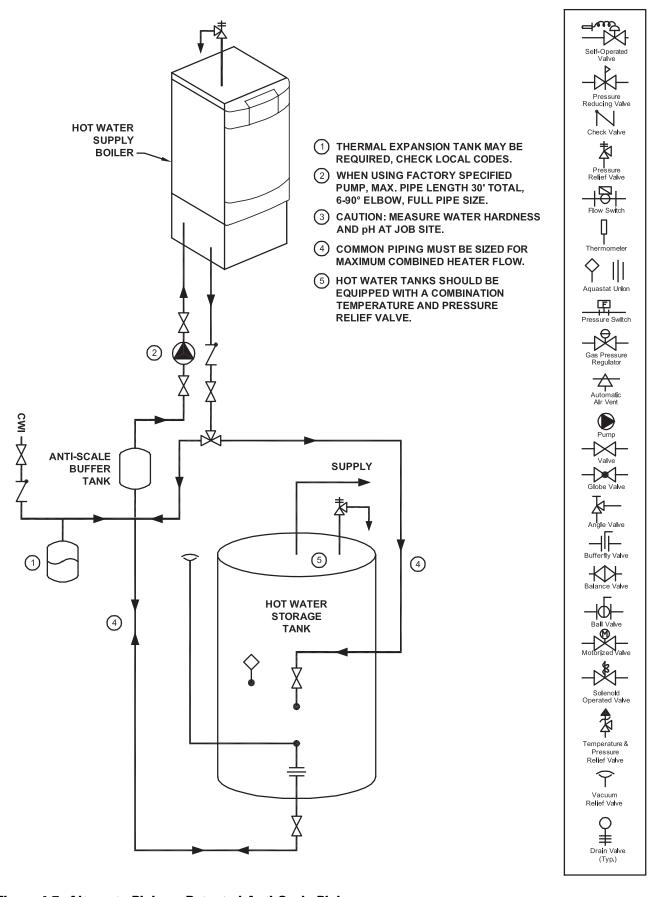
Alternate Piping - Patented Anti-Scale Piping
